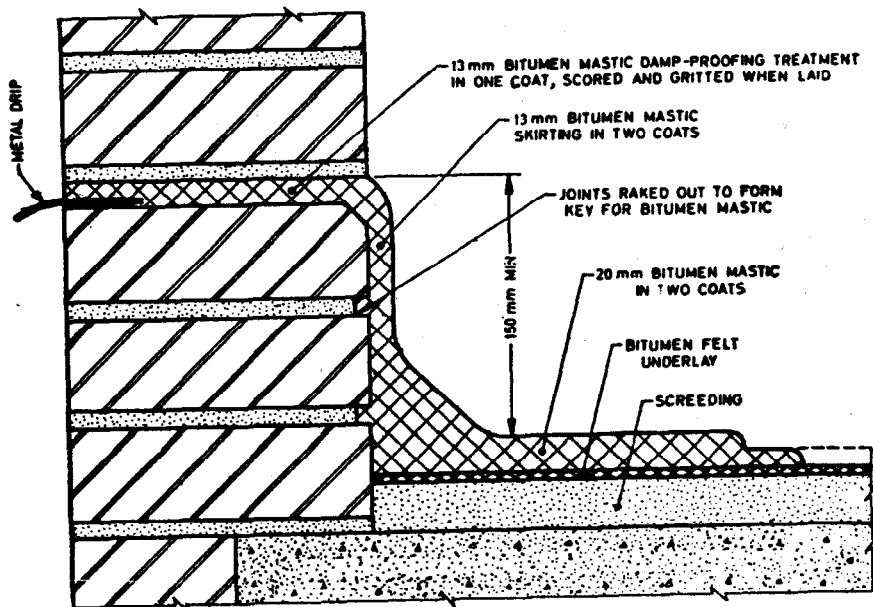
BITUMEN MASTIC LAID ON SCREEDED ROOF WITH BITUMEN MASTIC SKIRTING AND DAMP-PROOFING TREATMENT TO WALL
